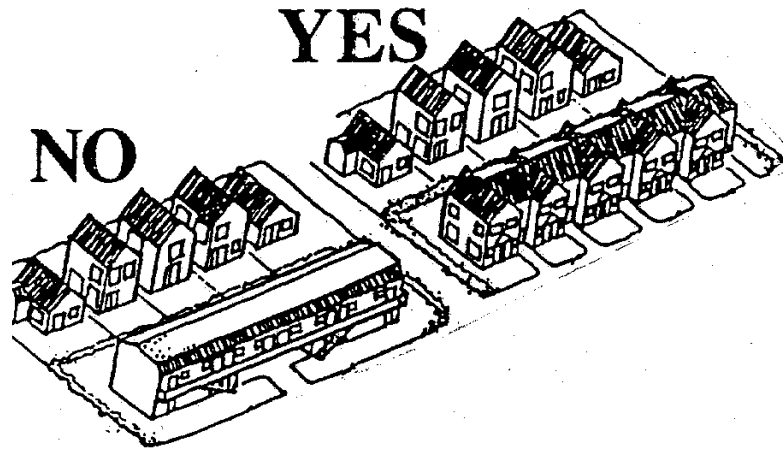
A(4). THE BUILDING ON THE RIGHT SHOWS HOW A MULTI-FAMILY STRUCTURE CAN BE DESIGNED TO COMPLEMENT AN EXISTING NEIGHBORHOOD THROUGH THE USE OF SIMILAR BUILDING MODULATION AND SETBACKS. THE BUILDING ON THE RIGHT COVERS ROUGHLY THE SAME LOT AREA AS THE STRUCTURE ON THE LEFT, WHILE APPEARING AS IF IT “FITS” IN ITS SURROUNDINGS.
